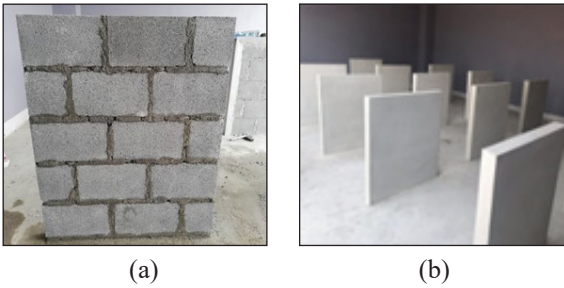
(a) Wall construction from concrete block and (b) plastering by mortar samples.
